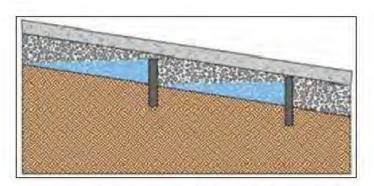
A. A "CHECK DAM" APPROACH MAY BE USEFUL IN LONG, SLOPED PAVEMENTS.
